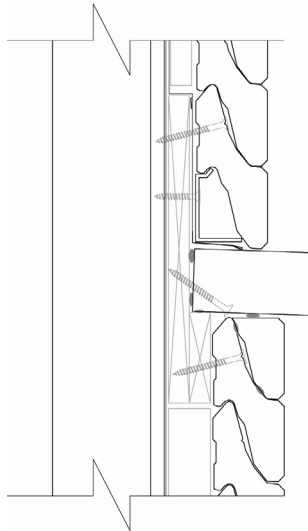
Detailed Mechanical Connection of the Concrete Window Sill
